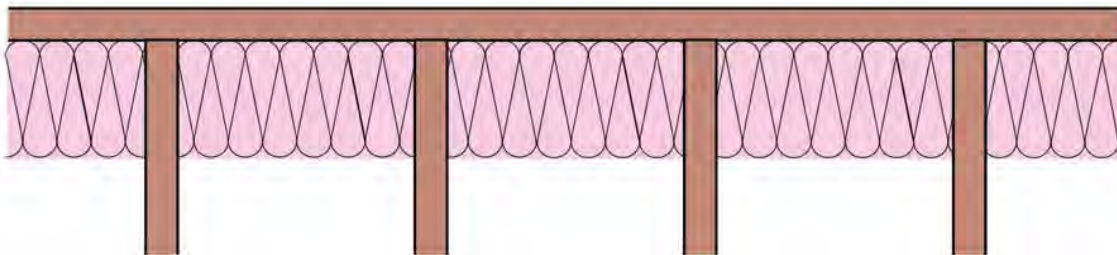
Plan section of rim joist, floor joists, and fiberglass batt insulation
